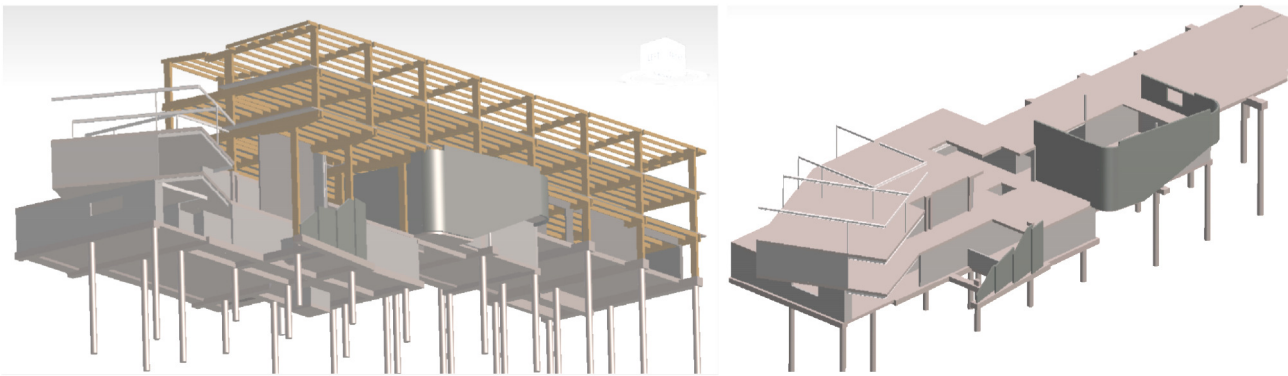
3D of overall structure, sitting on the complex heavyweight plinth, with plinth shown again from above.
